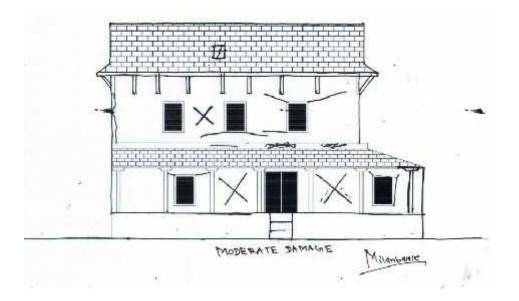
Damage Indicator: Moderate Damage (Cracks above 5mm, diagonal cracks in wall, fall of pieces of mud plaster, fall of few pieces of slate and stone etc.)
